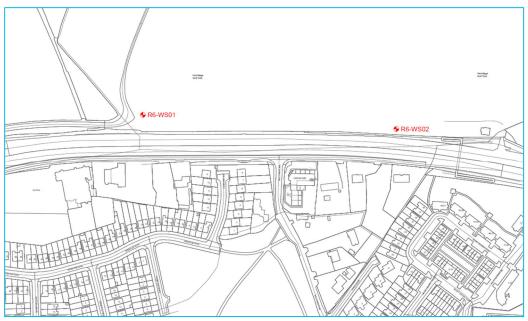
Hermitage Golf Club Retaining Wall Borehole Locations
